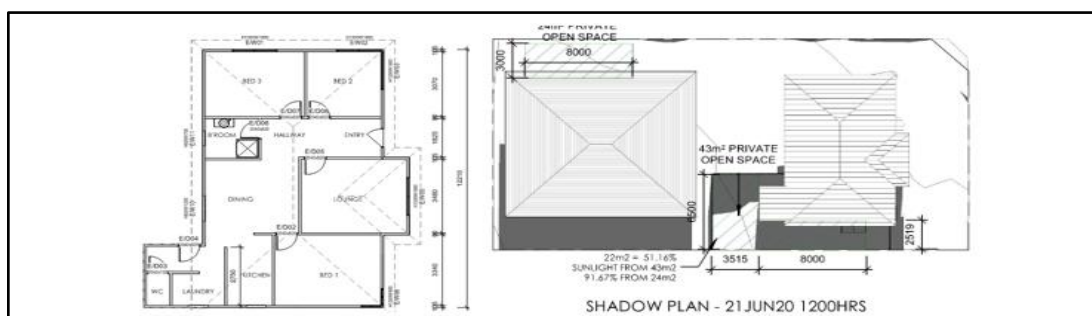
Floor Plan Existing dwelling - Shadow Diagram
